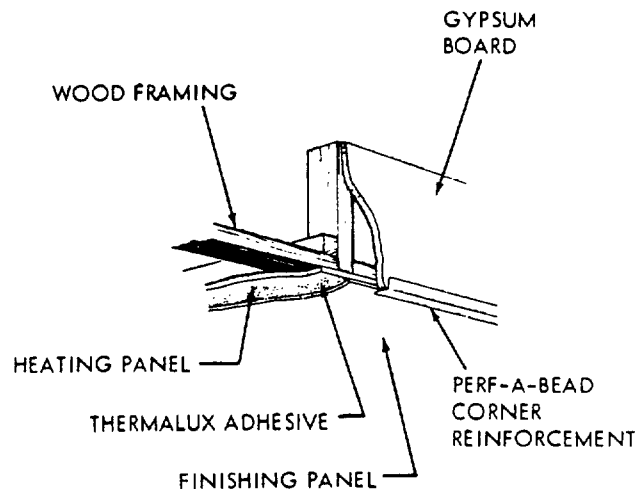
Isolating Heating Panel which Becomes Part of an External Corner
